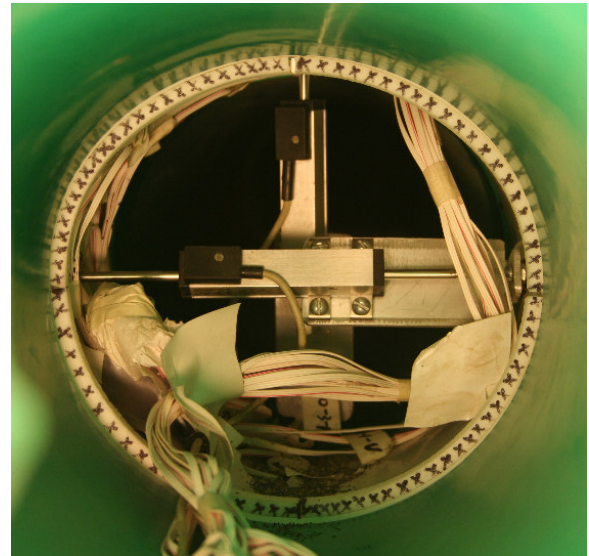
Deformed shape right before the fitting cracked in the buried fitting test
